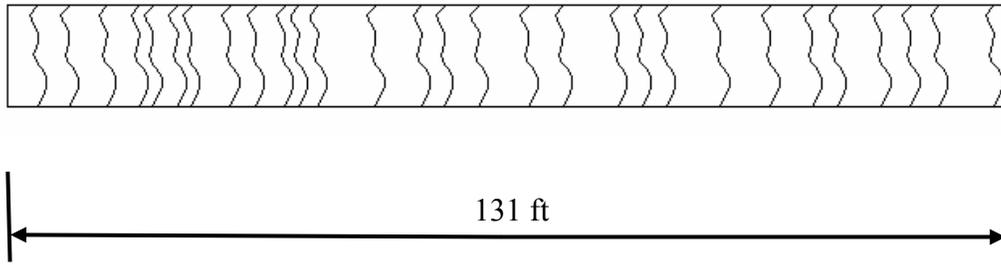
Layout of Cracks along Section 5—SnF1-6
